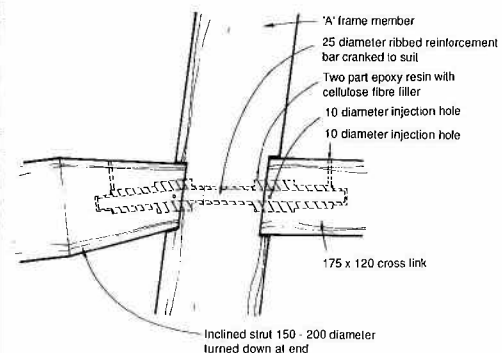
Detail of steel rod joint in stepped drilled hole
